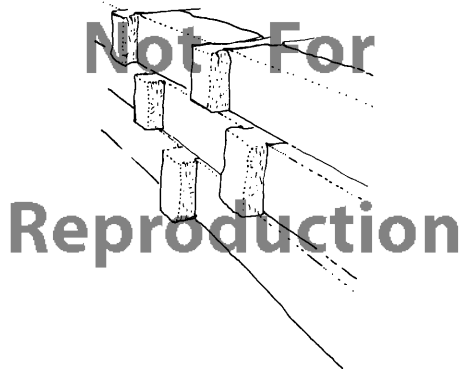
Sketch of projecting headers bolting facing stretchers to core.
